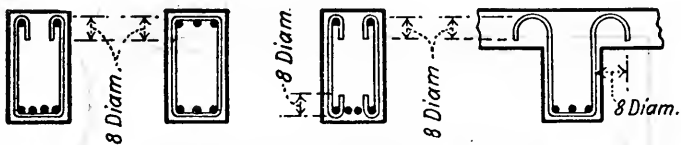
Typical Methods of Anchoring Vertical Stirrups
